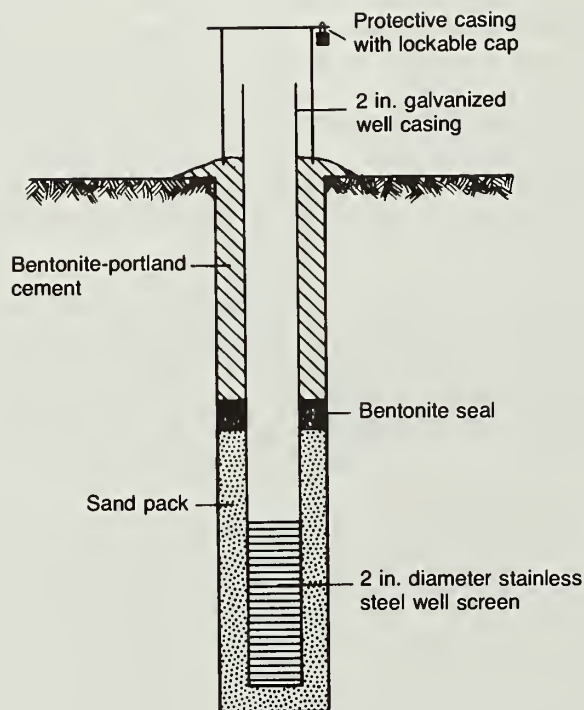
Typical construction of monitoring wells and piezometers at Pagel's Landfill.
